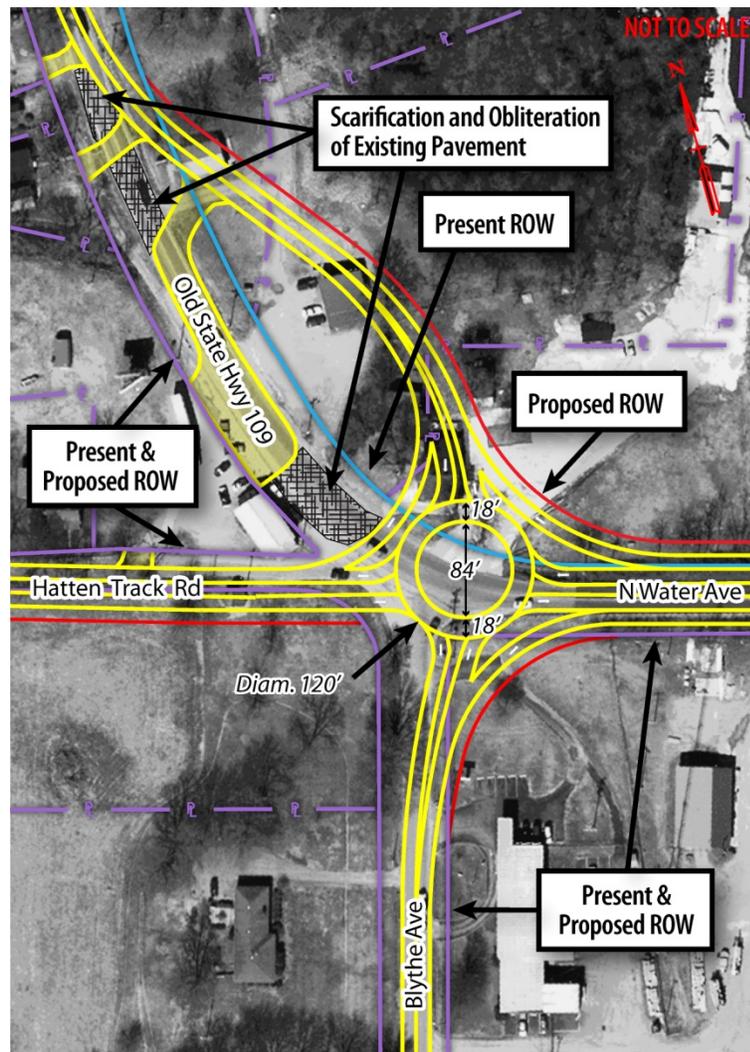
Proposed Realignment Concept for Blythe Avenue/Old Highway 109/North Water Avenue/Hatten Track Road Intersection
